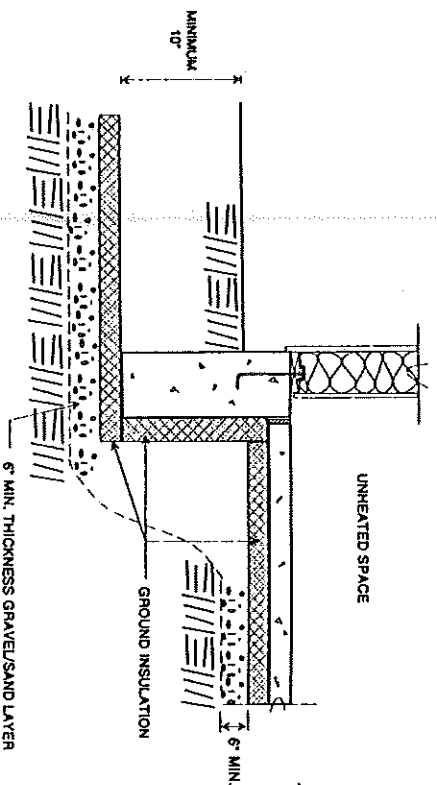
FPSF Design for Unheated Space with Independent Slab and Stem Wall.
